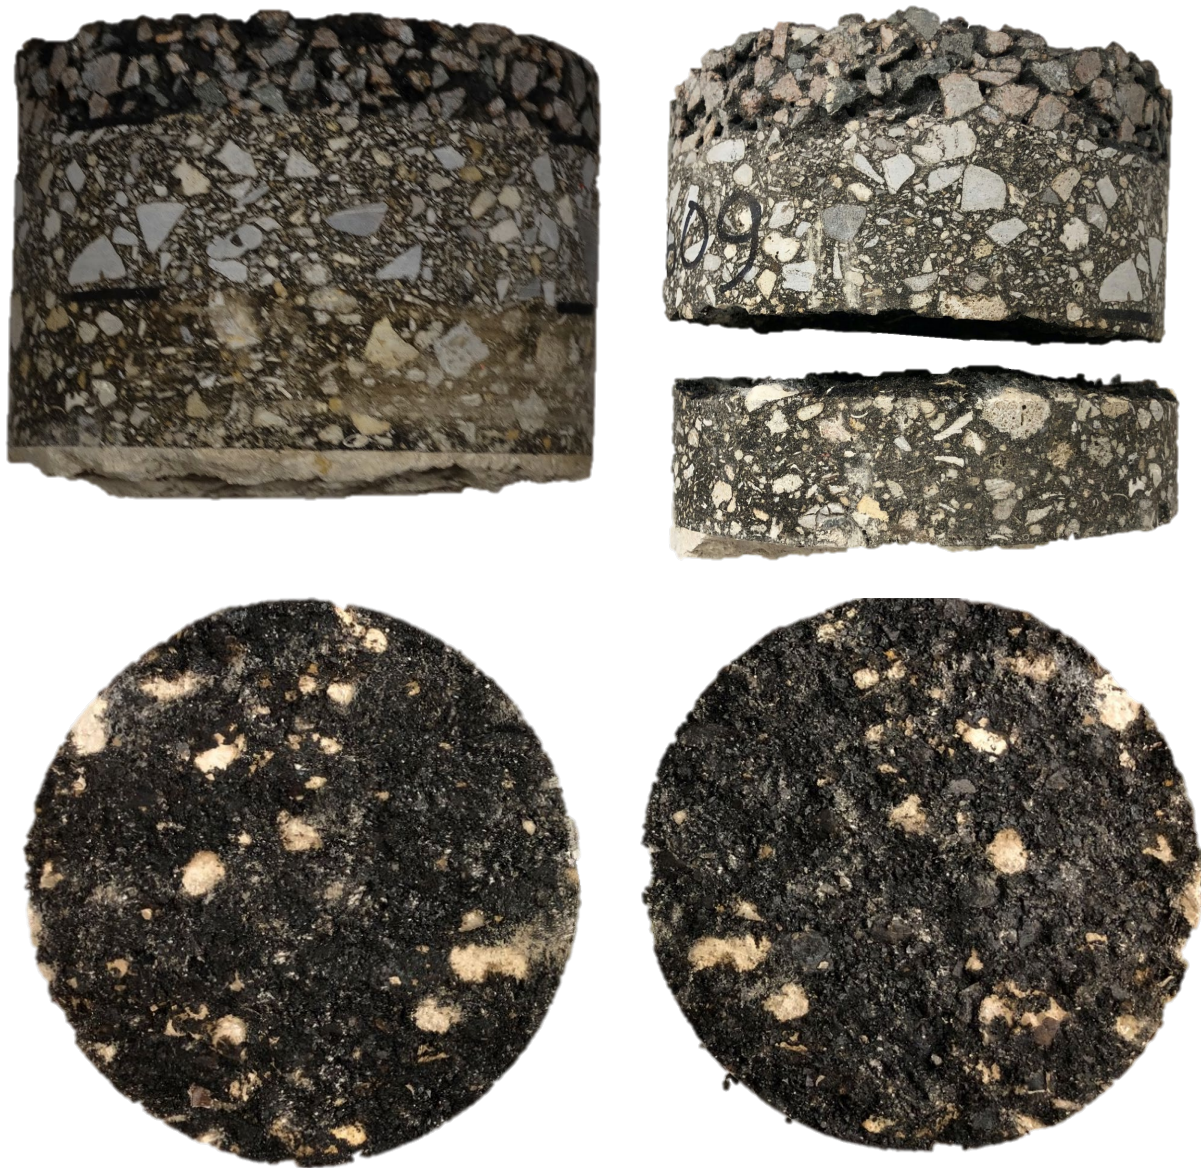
US 17 Worm Section MP 31.146 Bond Test Failure Outside of Interface
